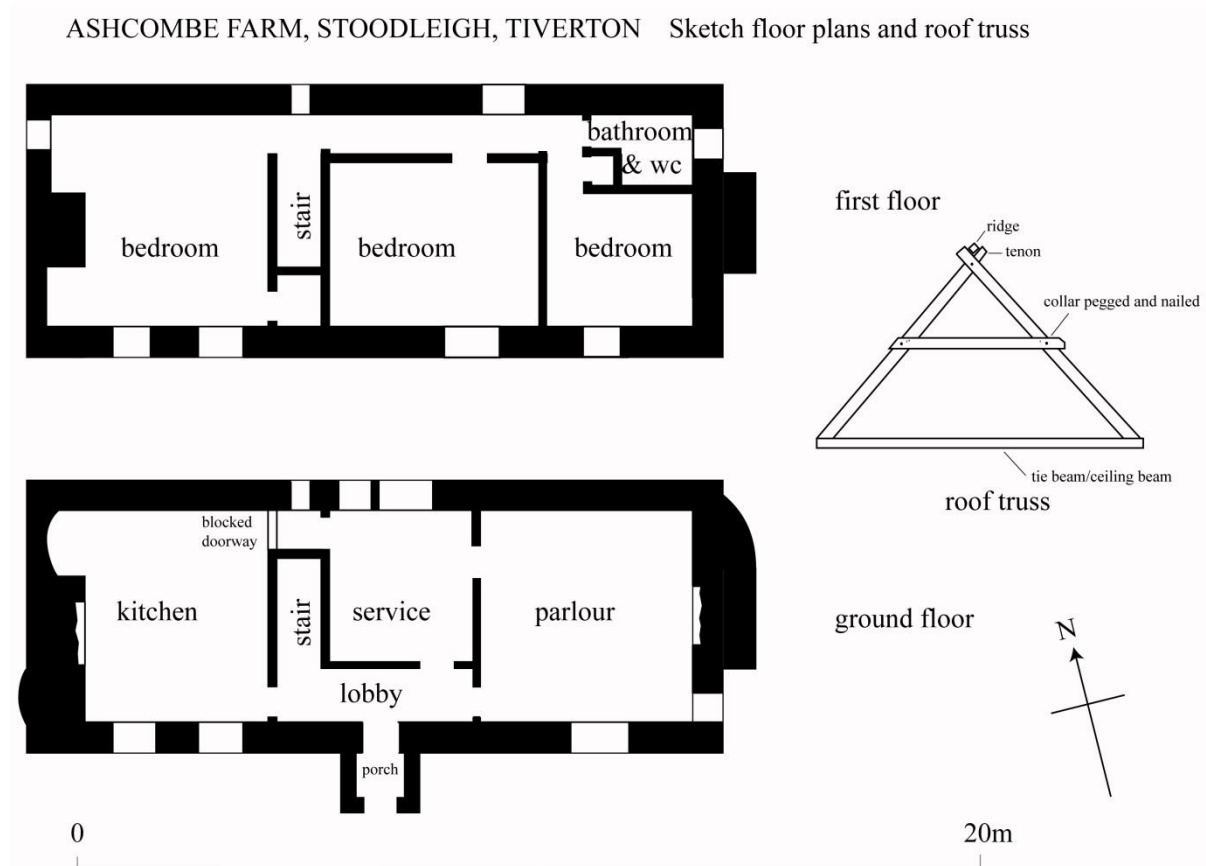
Sketch floor plans and roof truss of Ashcombe Farmhouse.
